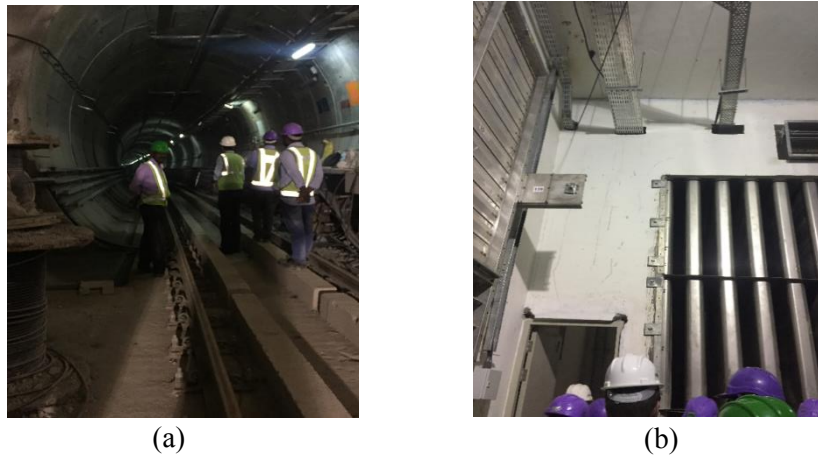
(a) Metro-Rail tunnel in the 'fit-out' phase; and (b) A detail of the station showing the drilling of holes in the wall for high-level cables
